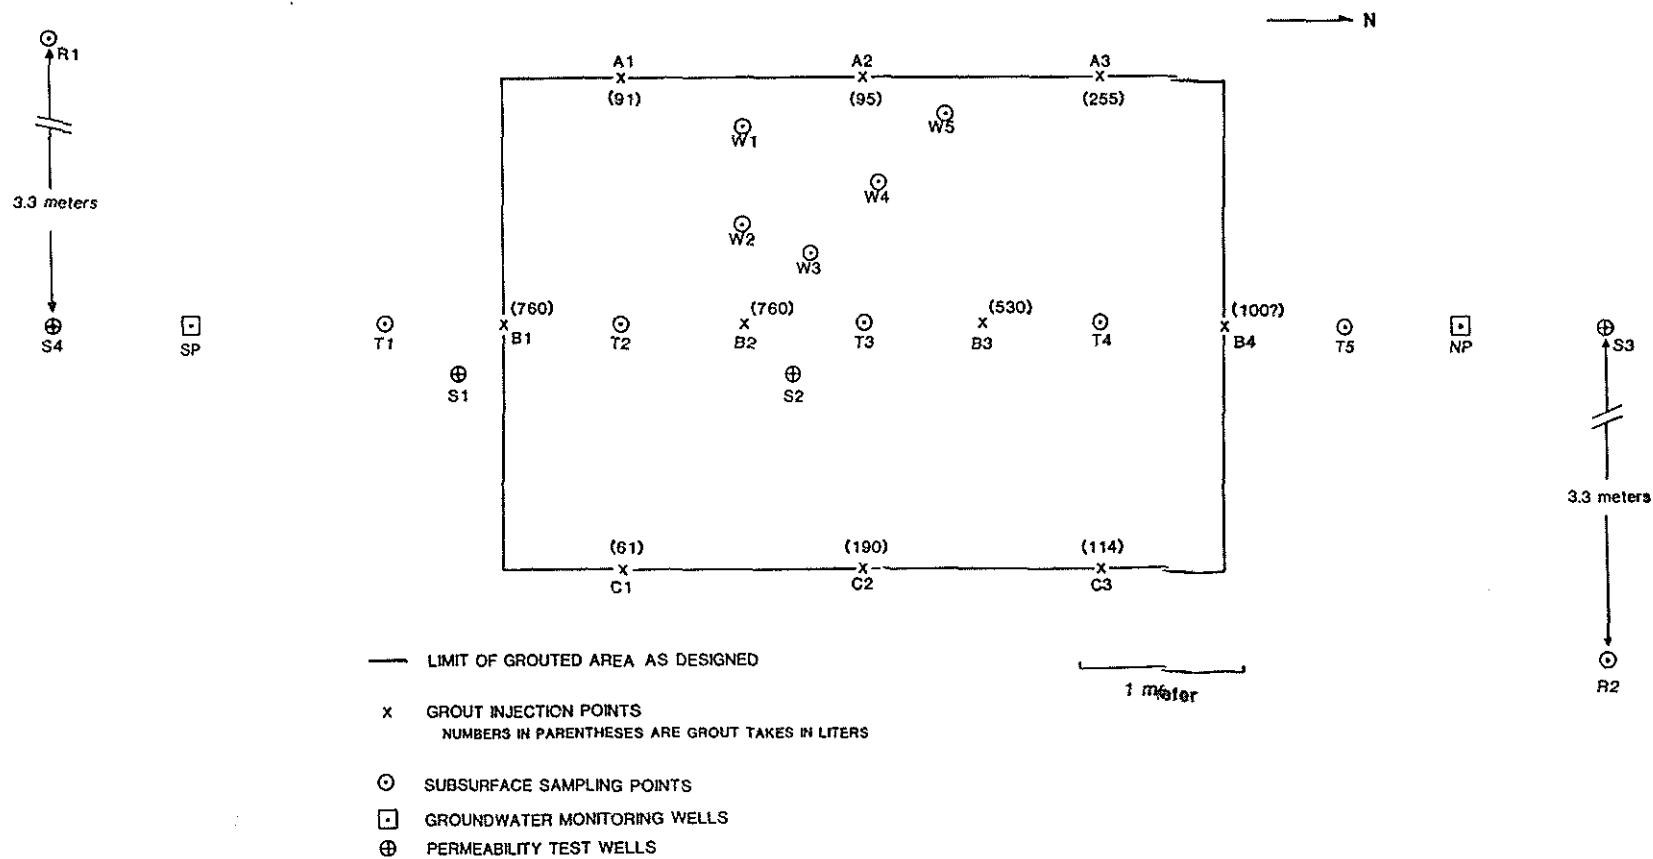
Layout of injection and test borings at the large-scale chemical grouting test area.
